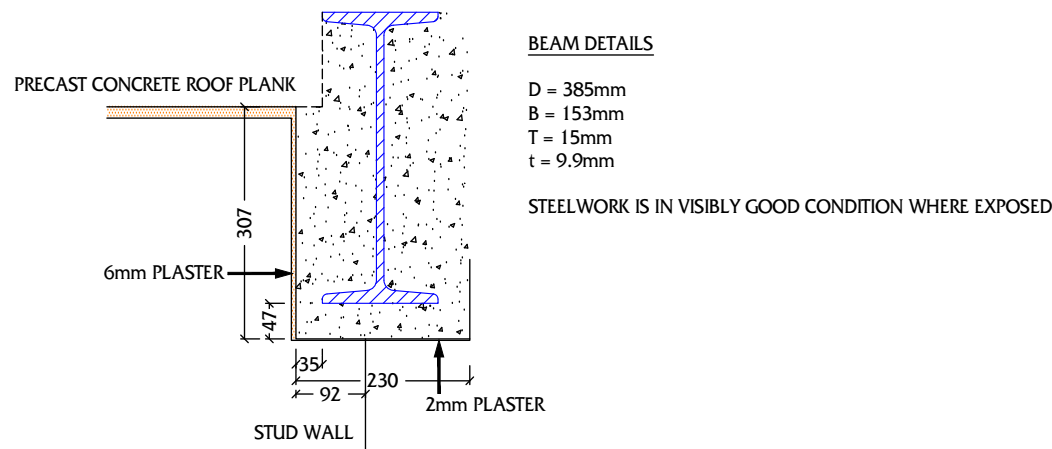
PART SECTION LOOKING WEST THROUGH PRIMARY BEAM G/2-3 SCALE 1:10
